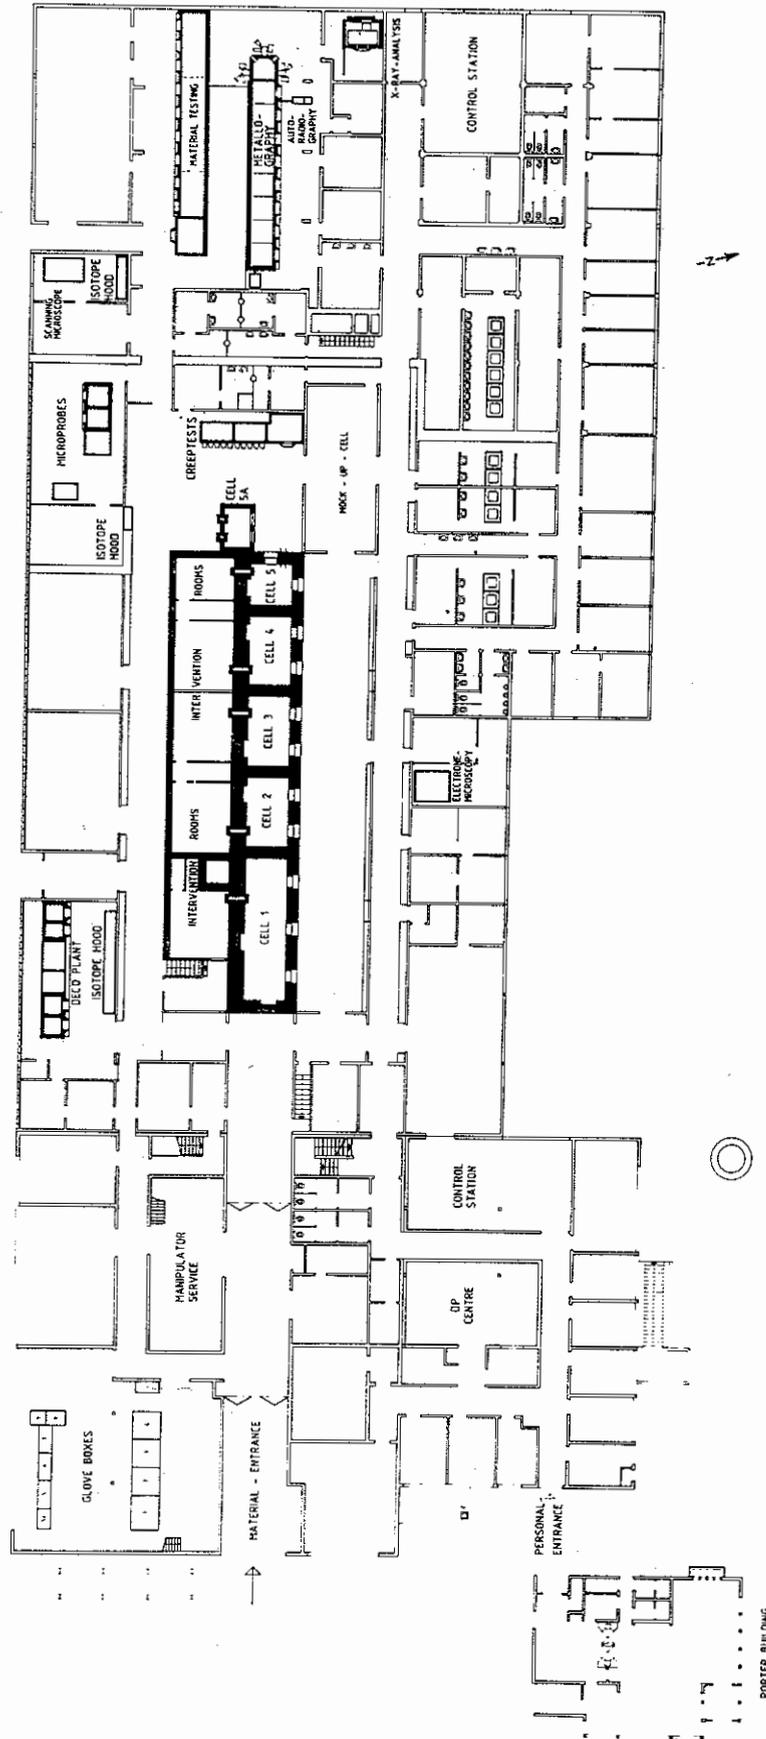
Floor plan of the entire KFK Hot Cell facility.
